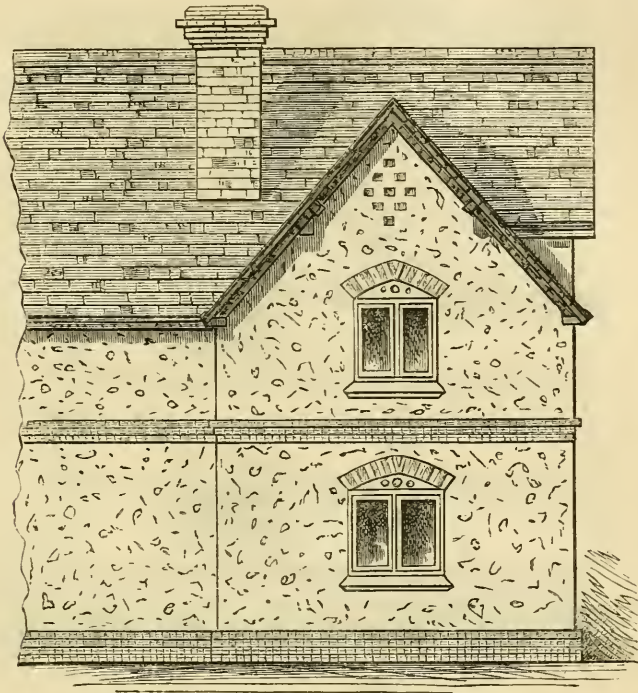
Plate II.—Concrete Cottage, with further Ornamentation in Brickwork.
